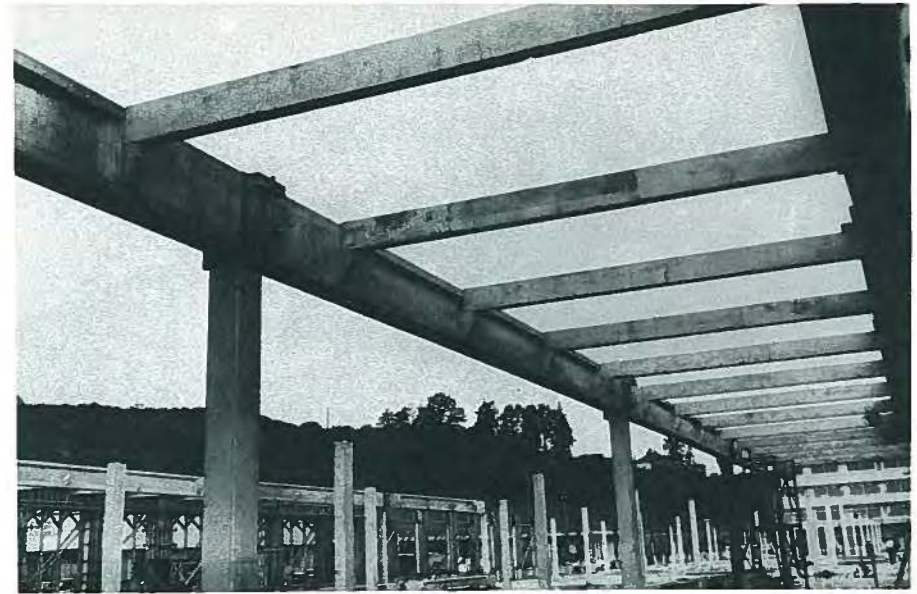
Following girder erection 5 x 12-in. (128 x 305 mm) prestressed beams were set in the girder corbels and tied-in to stiffen the frame.
